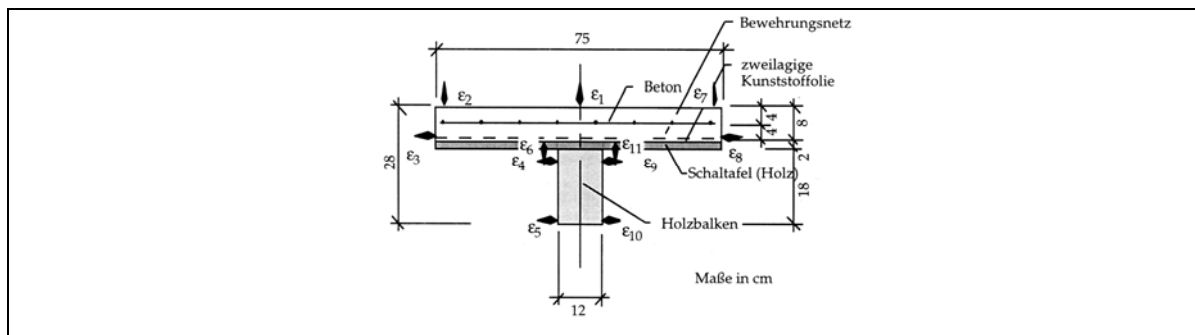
Cross-section. Measurements in mm. The beam is composed of timber beams (Holzbalken) and a concrete slab (Beton) with a reinforcement net (Bewehrungsnetz).
